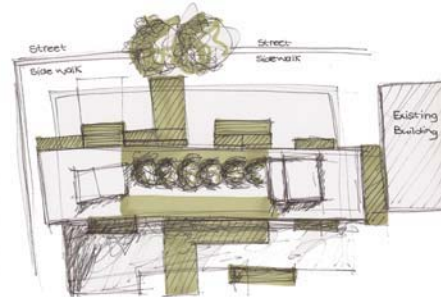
Roof plan showing the new box structures clipped to the northern and southern façade
